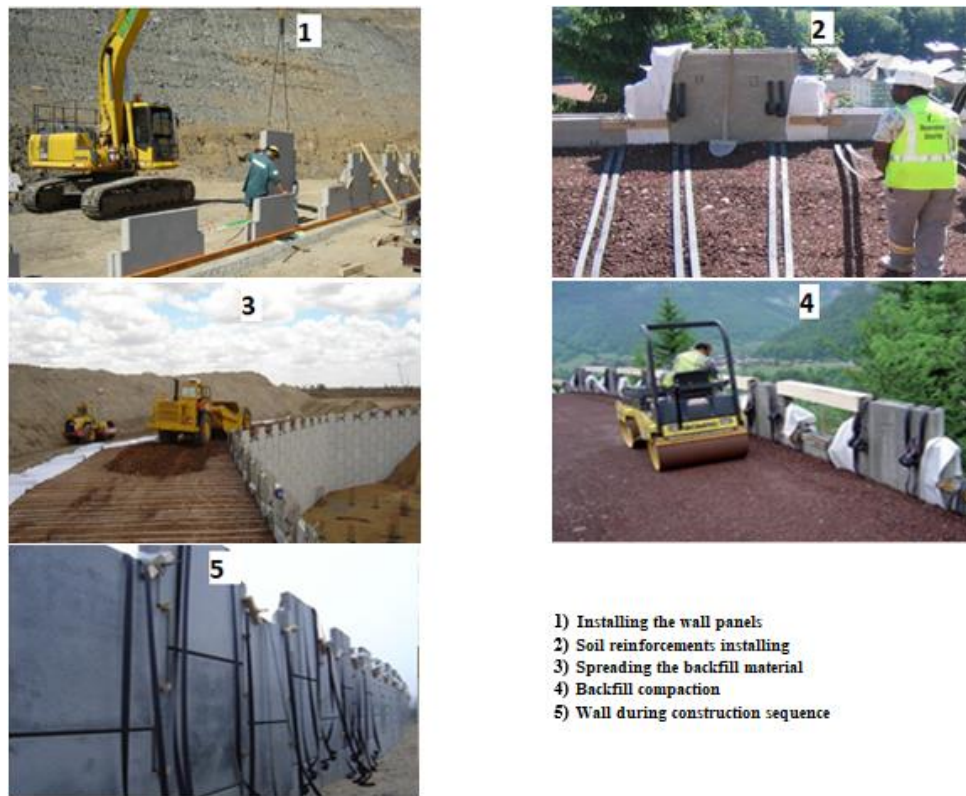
Construction sequence for retaining wall with unidirectional strips
